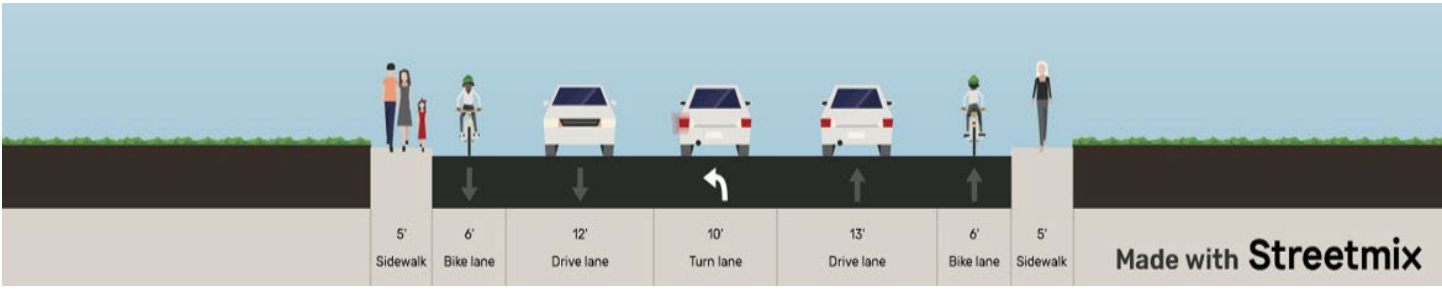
The intersection of Northeast 86th Avenue and Northeast 15th St has sidewalks and unbuffered bike and small mobility facilities in both directions, travel lanes, and a dedicated left turn lane.
